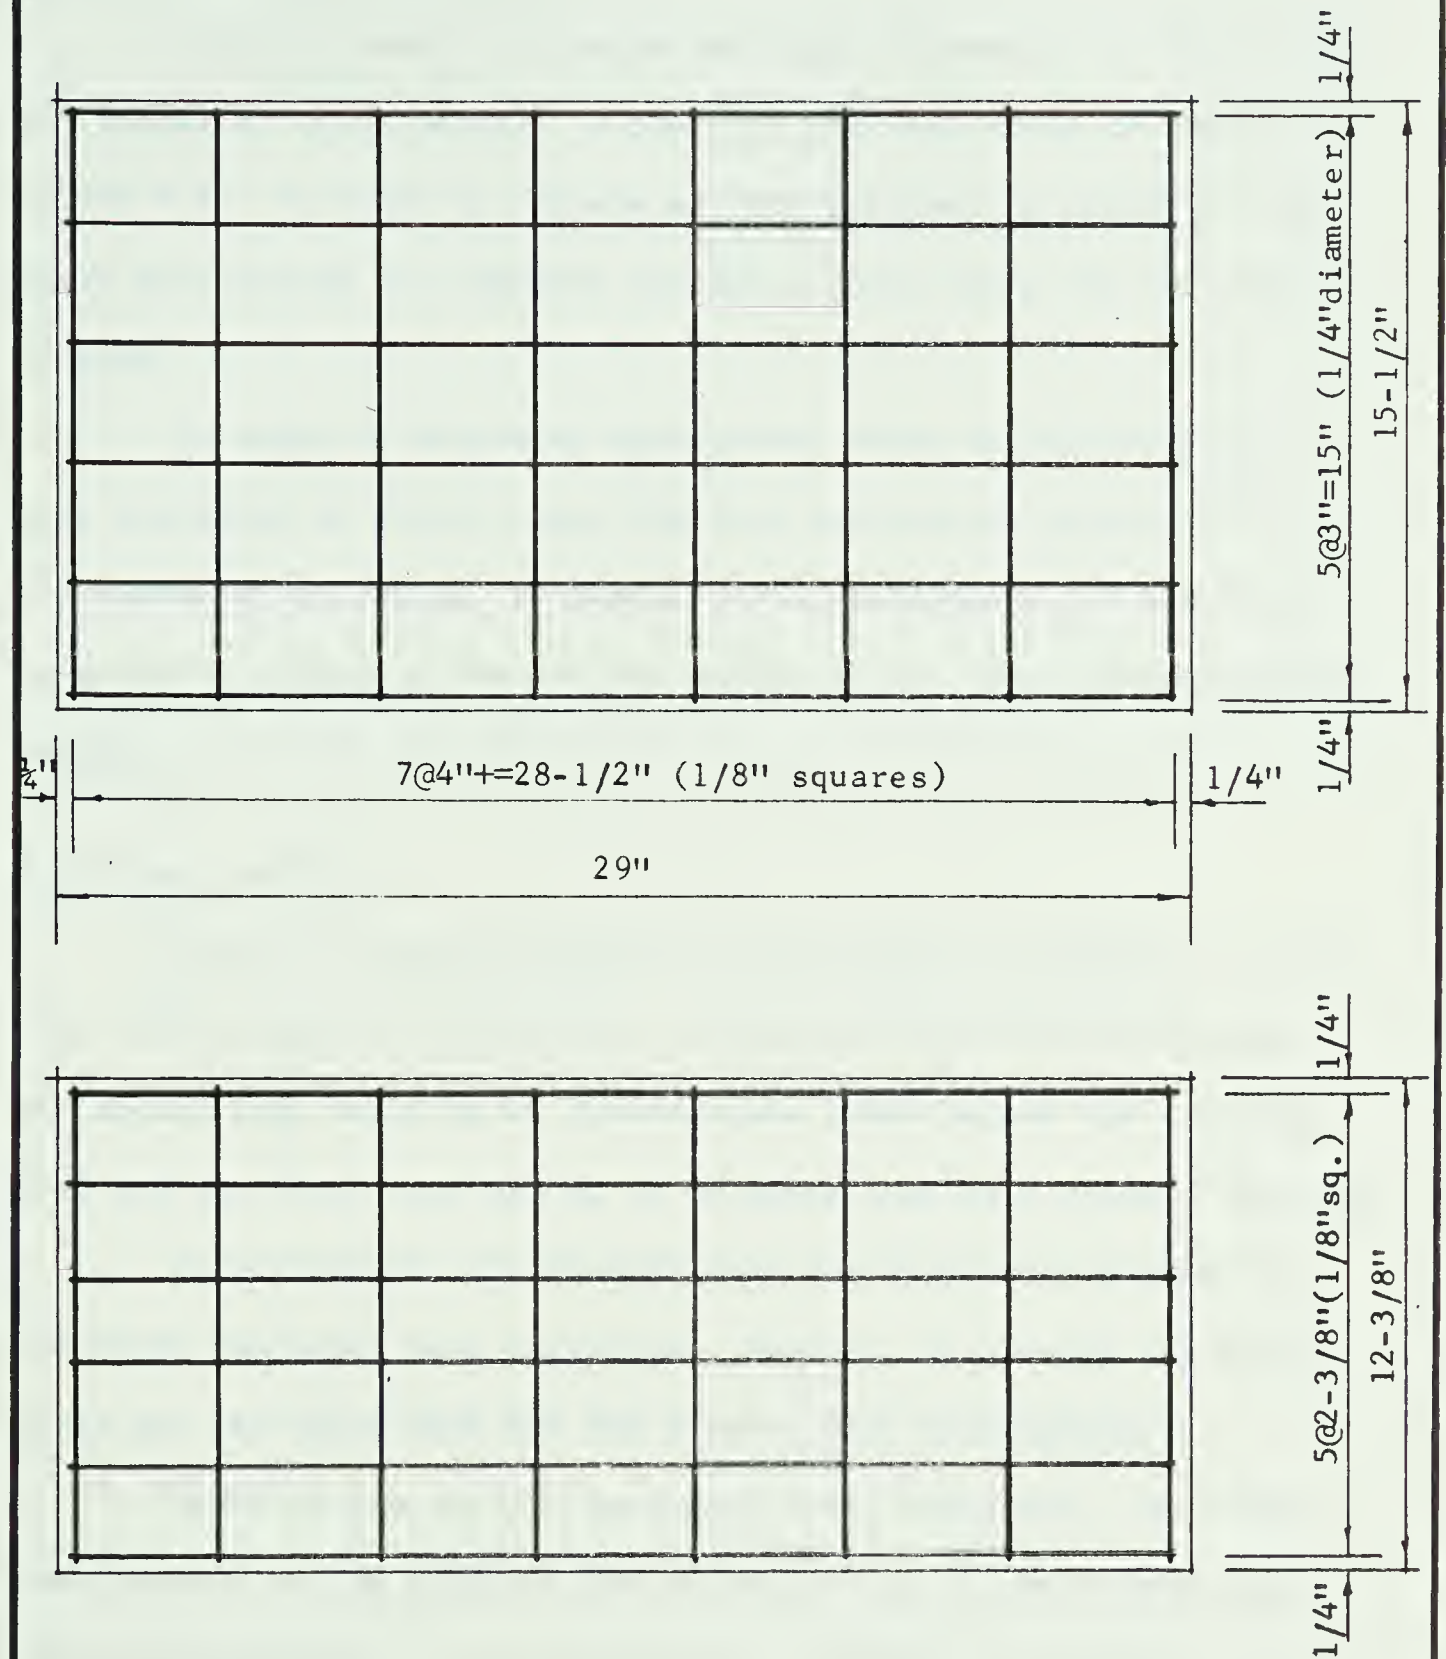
LAYOUT OF MOMENT-STEEL STRAIN BEAMS
